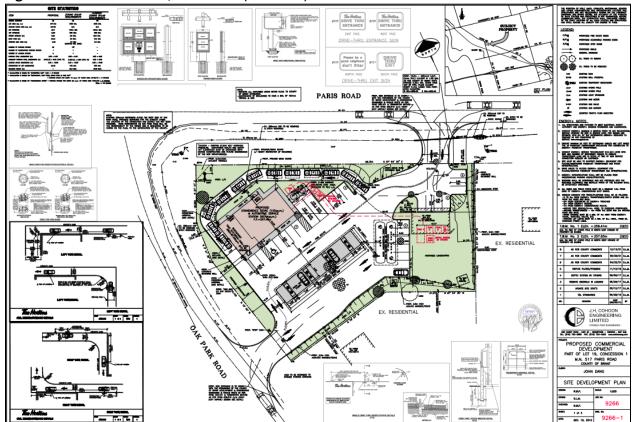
517 Paris Road, Brantford (Site Plan)
